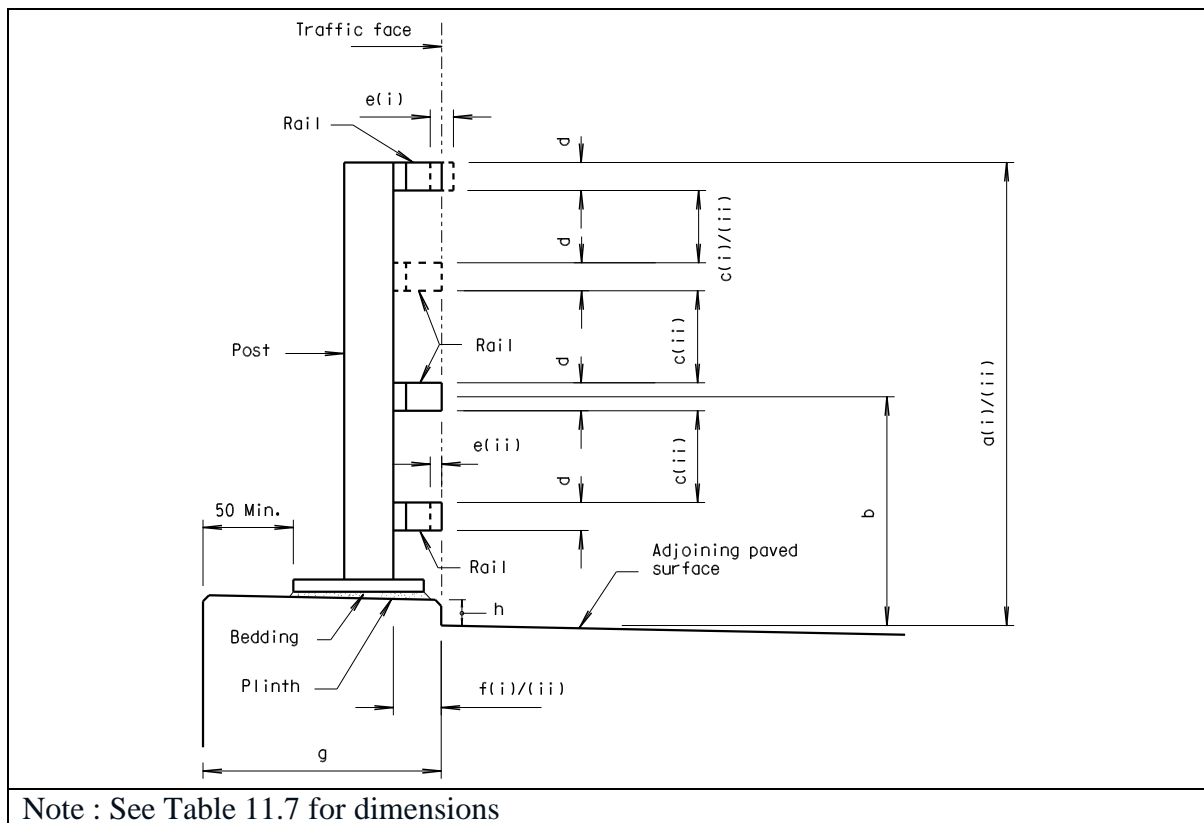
Dimension of Vehicle Combined Metal and Concrete Parapets
